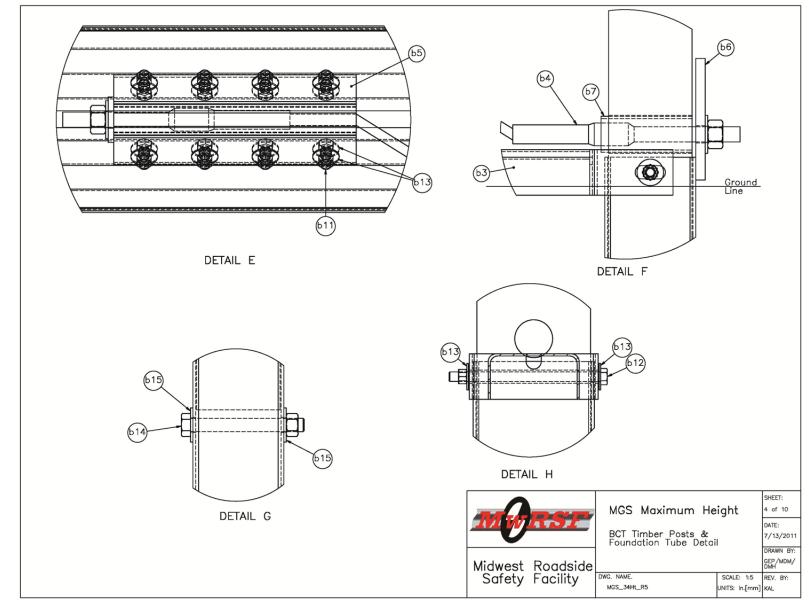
BCT End Anchor Details, Test No. MGSMRH-1
